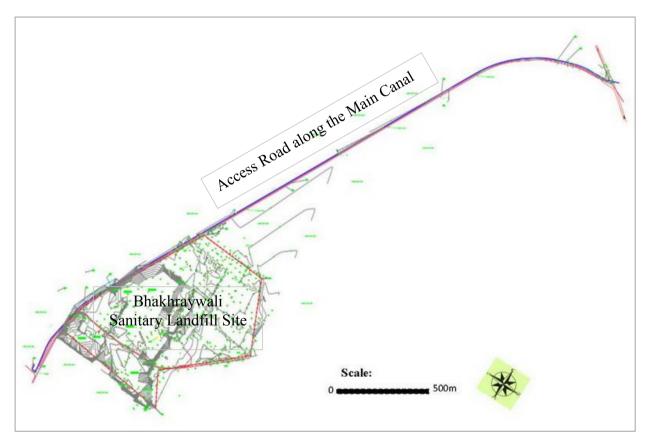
Access Road of Bhakhraywali Sanitary Landfill Facility
